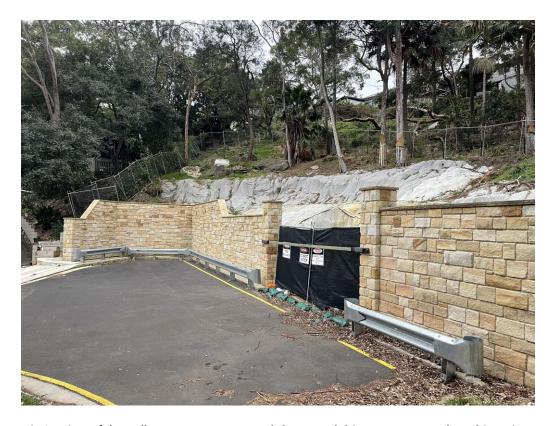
View of the Bellara Avenue eastern cul-de-sac and driveway entry to the subject sites (via 32 Bellara Avenue), looking north-east
